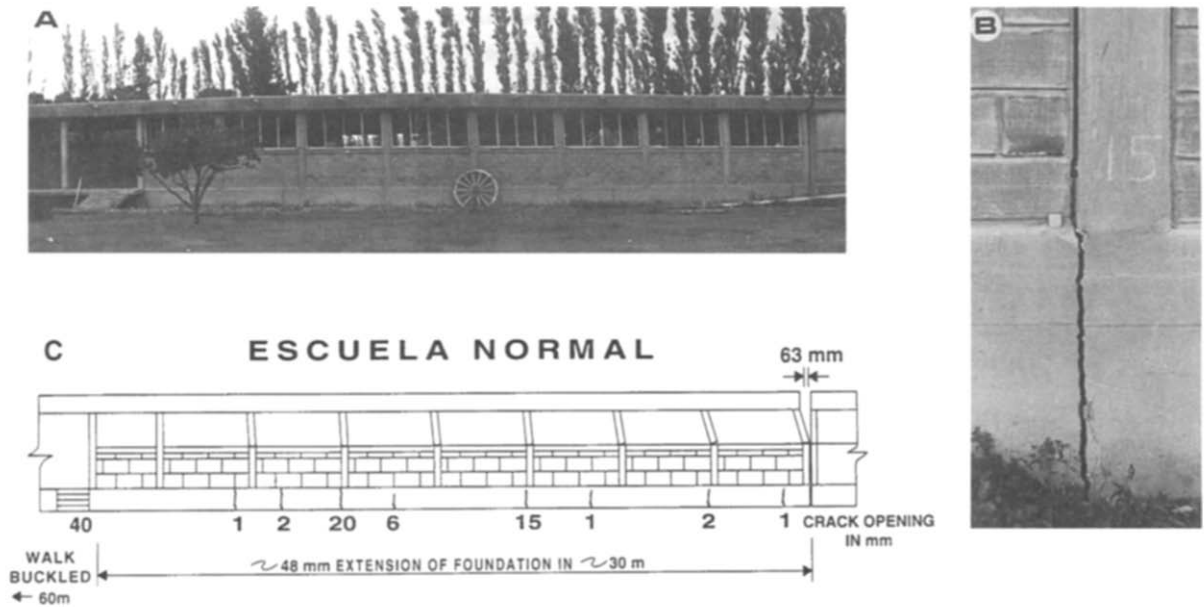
(A). Section of building damaged by extensional ground displacement at Escuela Normal. (B) Extensional crack in foundation with 20-mm opening. (C) Diagram of damaged section of building showing observed offset columns and foundation cracks. (After Youd, 1989.)
